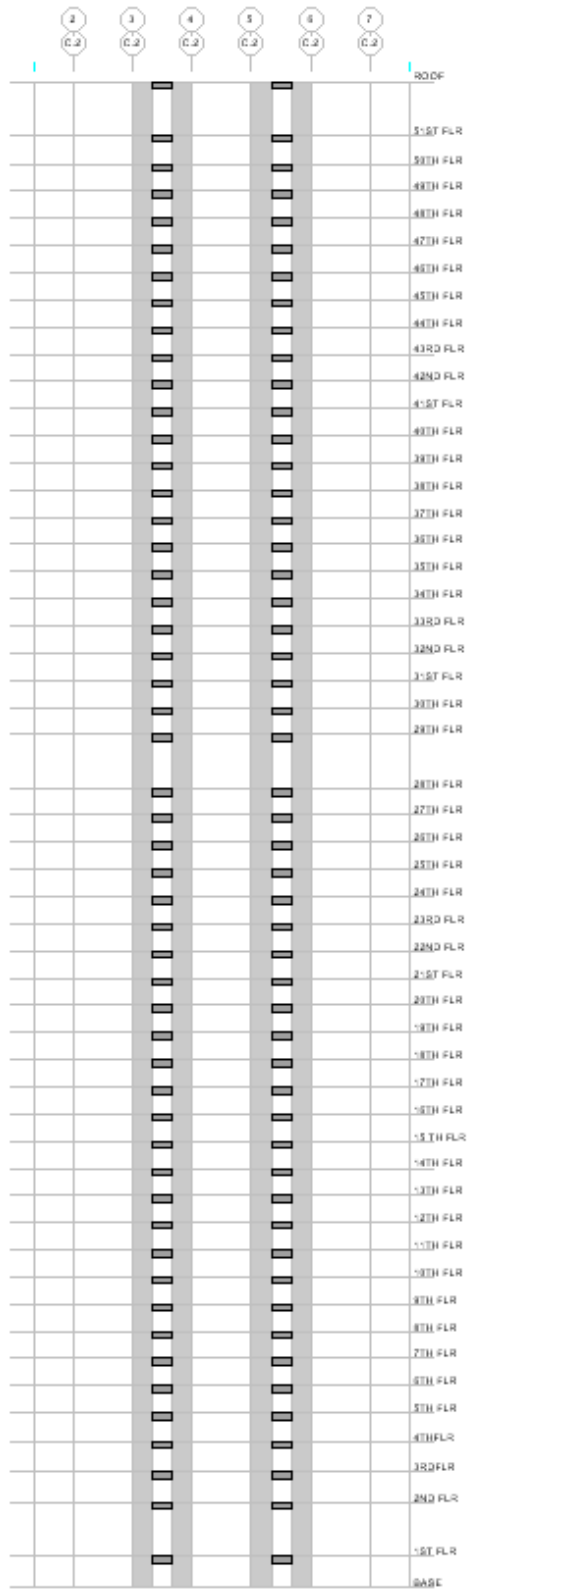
Alternative Lateral System Elevation (Grids B.8 & C.2)
